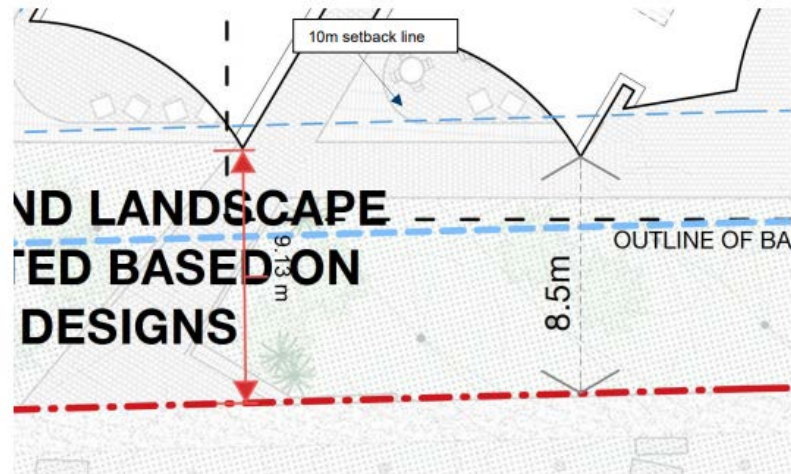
Building B plan indicating point encroachments to Solent Circuit front setback control.
